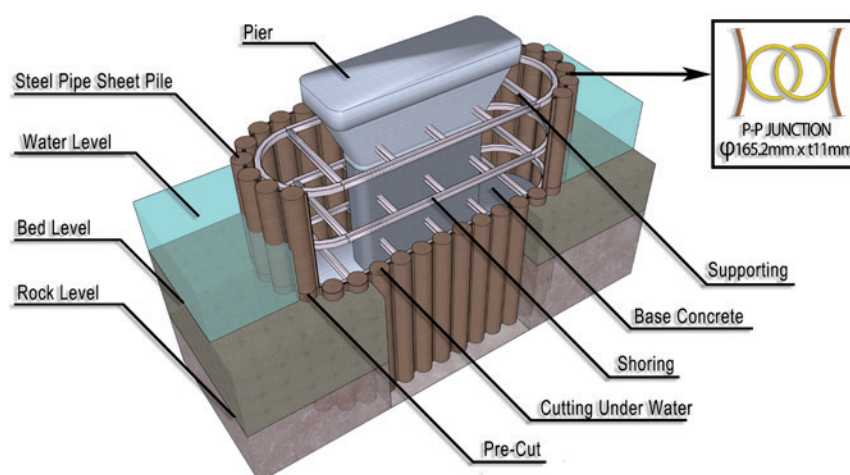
Illustrative Model of Steel Pipe Sheet Pile Foundation
